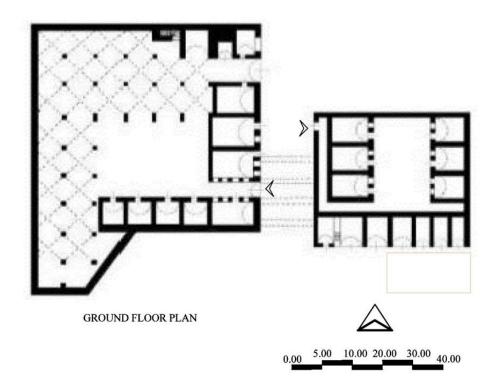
The ground floor plan of Sayınlar Soap Factory, Nizip (Source: Eker, 2006)
